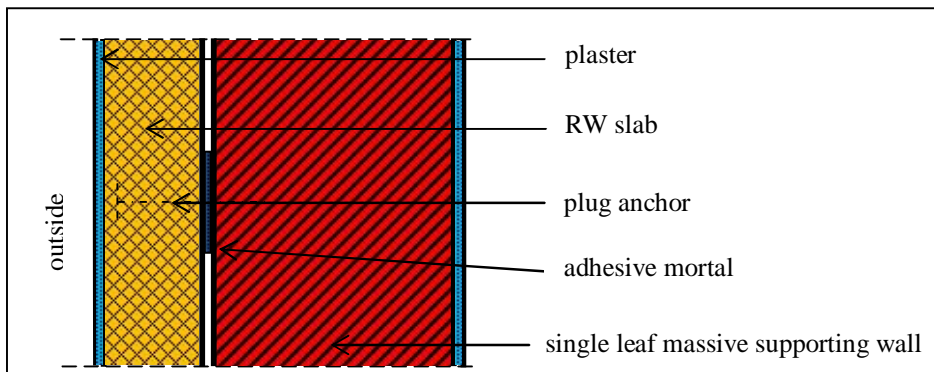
Detailed build-up of an originally single leaf massive external wall provided with plastered RW slab thermal insulation system I. (Kocsis, 2010)
